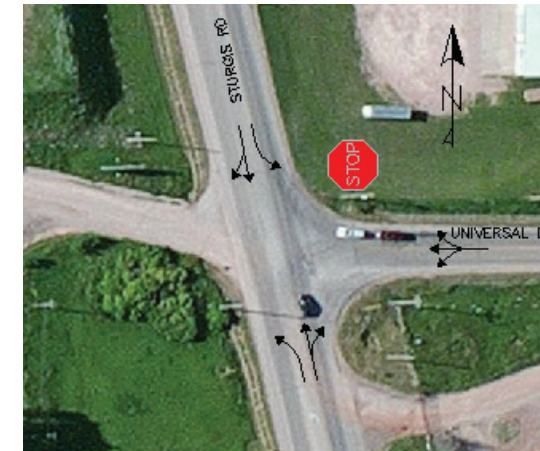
Sturgis Road & Universal Drive Intersection Configuration
